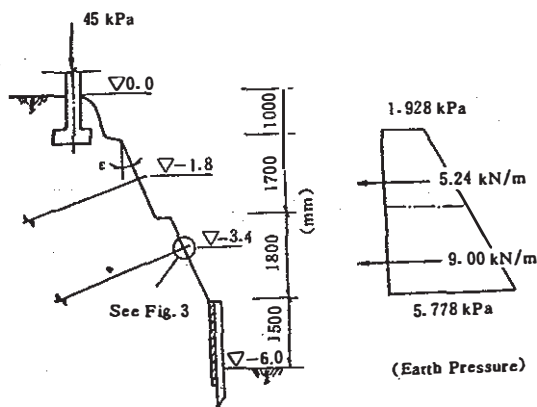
Facing of foundation pit and earth pressure in Xiaogan supermarket
